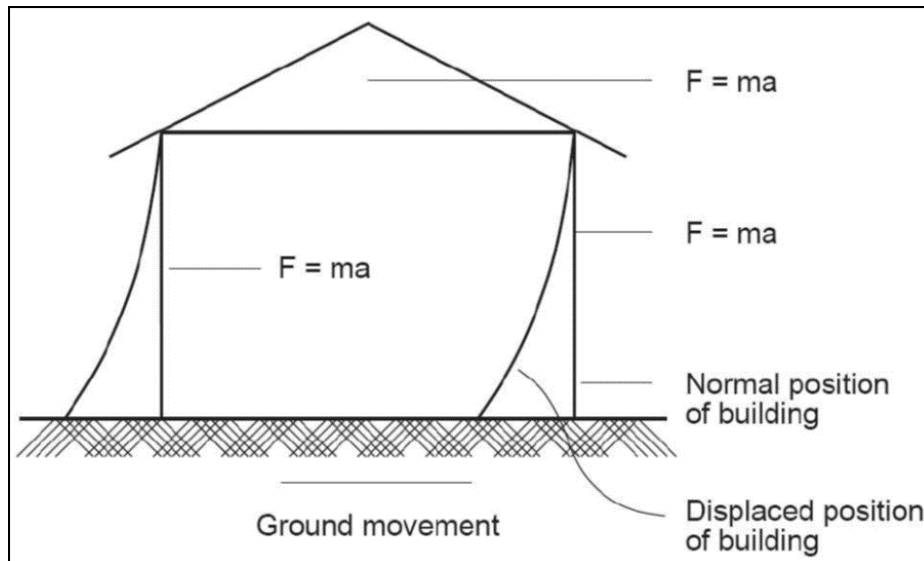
Failure mechanism of a URM building (ISET, 1986)
